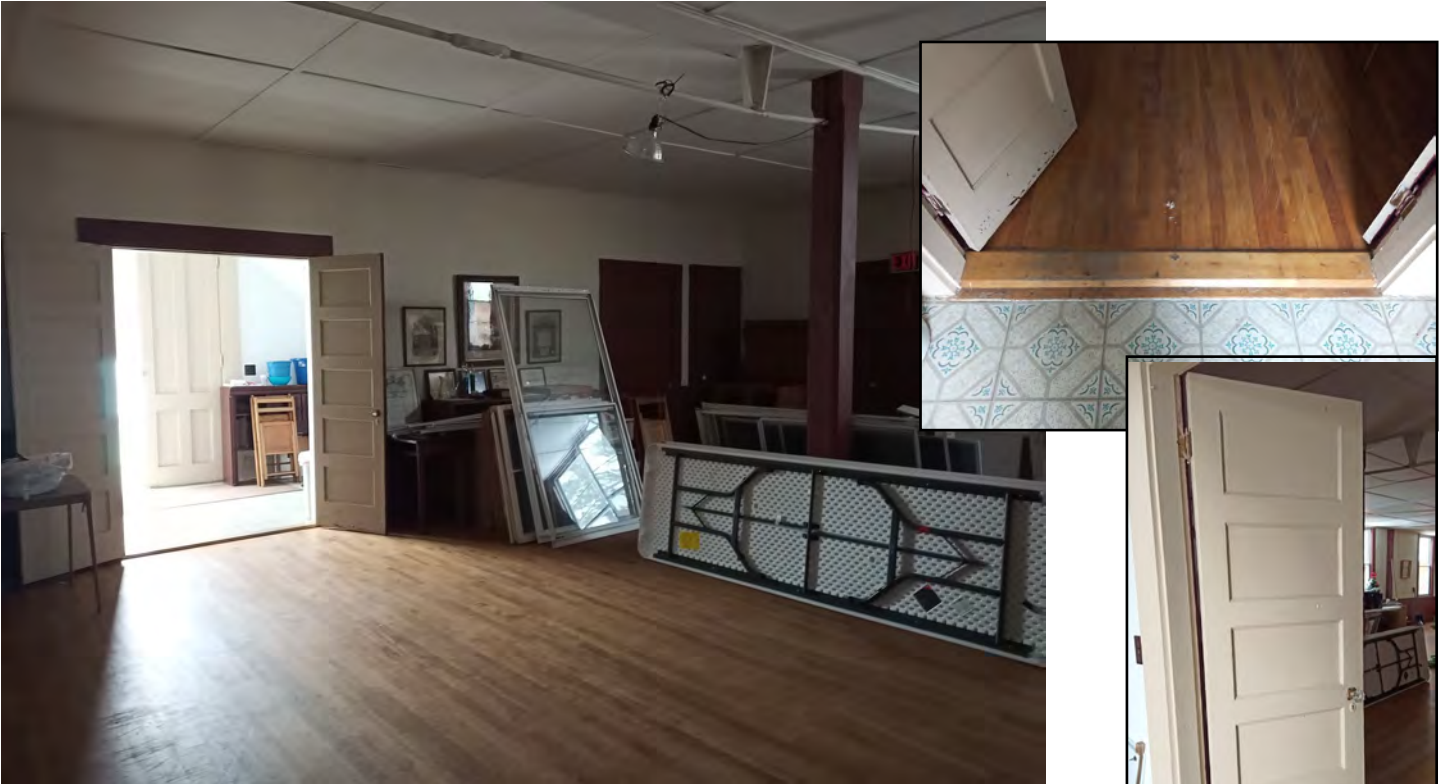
View from main hall toward south; Inset top: Juxtaposition of main hall narrow strip wood flooring and vestibule resilient roll flooring; Inset bottom: Five-panel solid wood door at main hall entry
